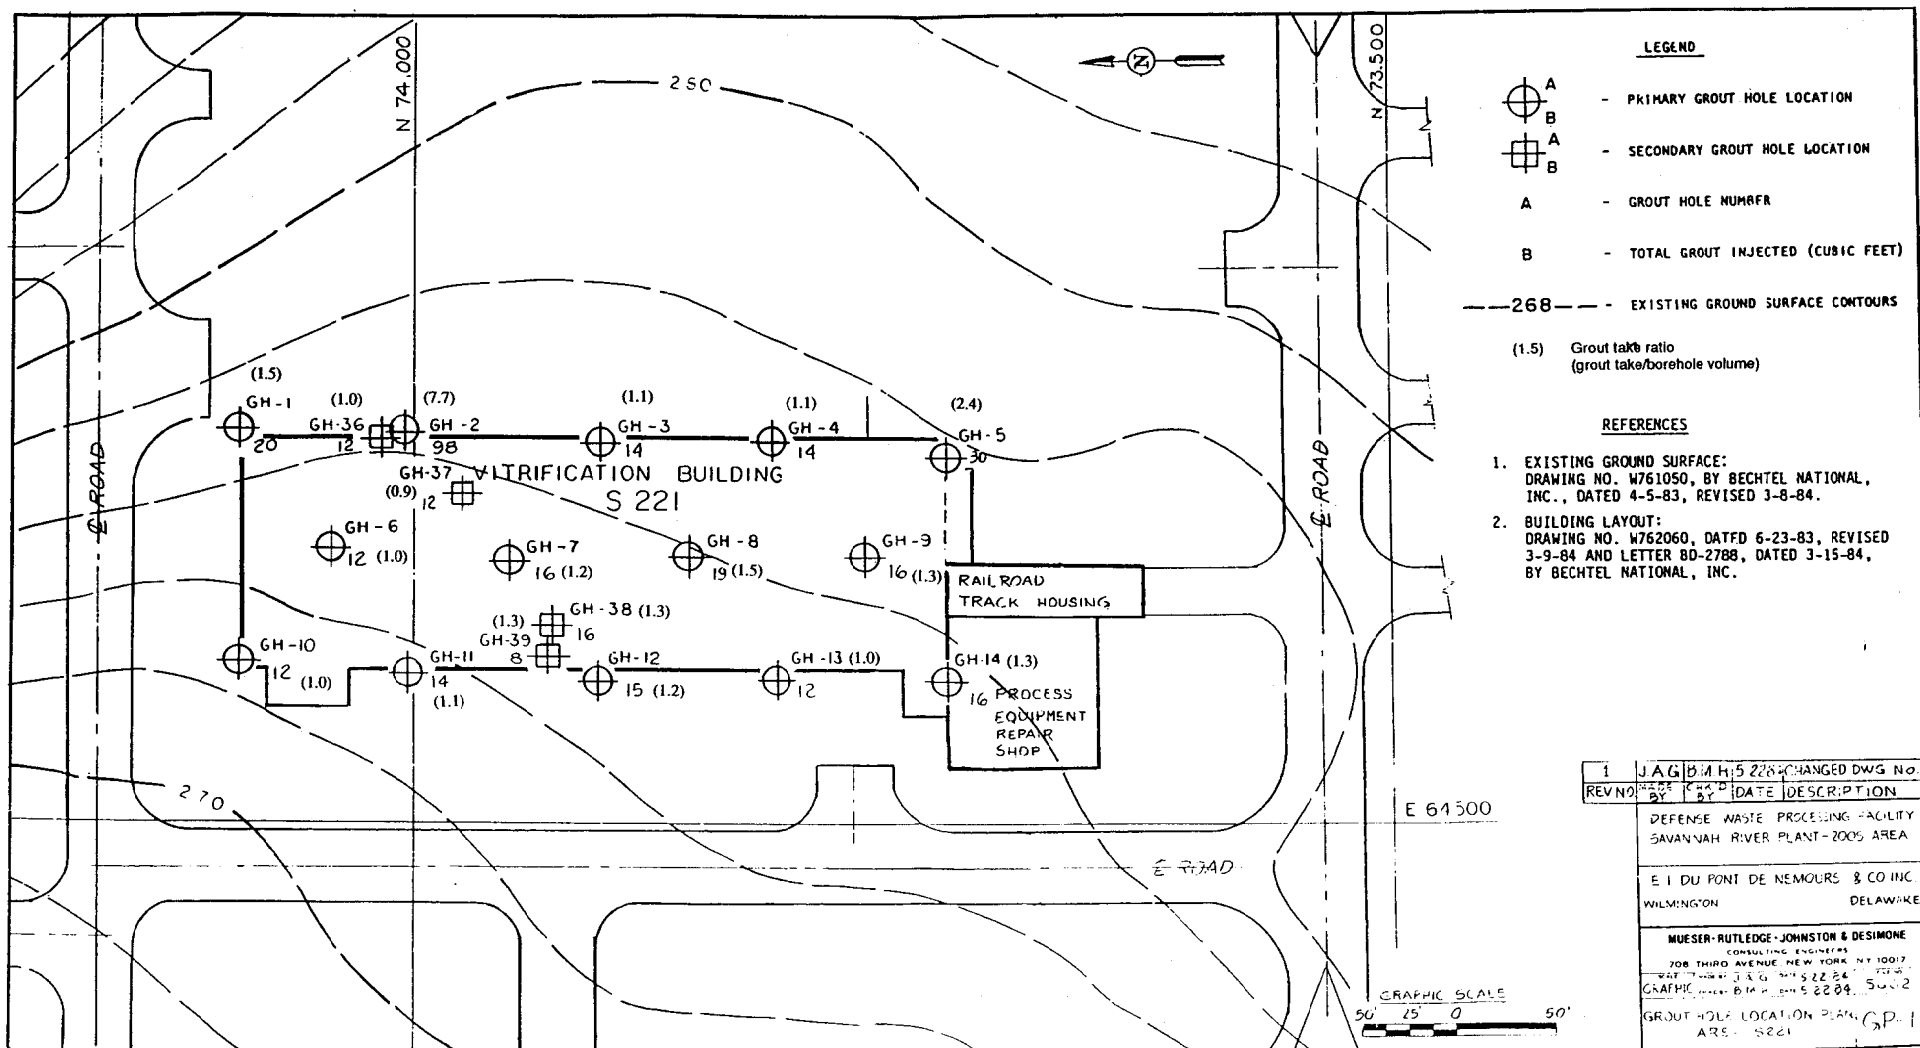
Grout Hole Location Plan and Grout Takes for the Vitrification Building.
